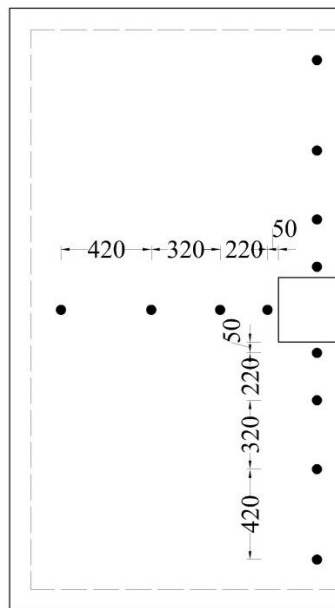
Typical arrangement of LVDTs (Dimensions in mm)
